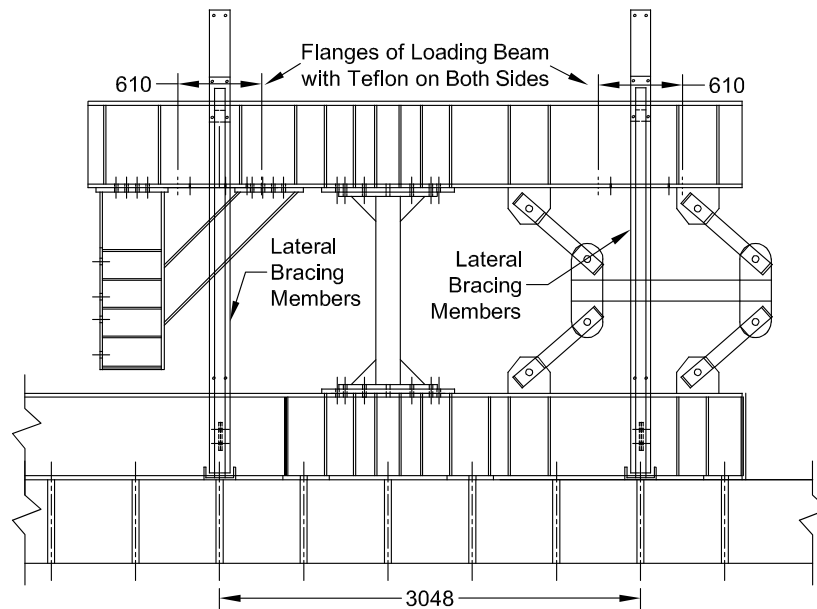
Elevation of Loading Beam Lateral Bracing
